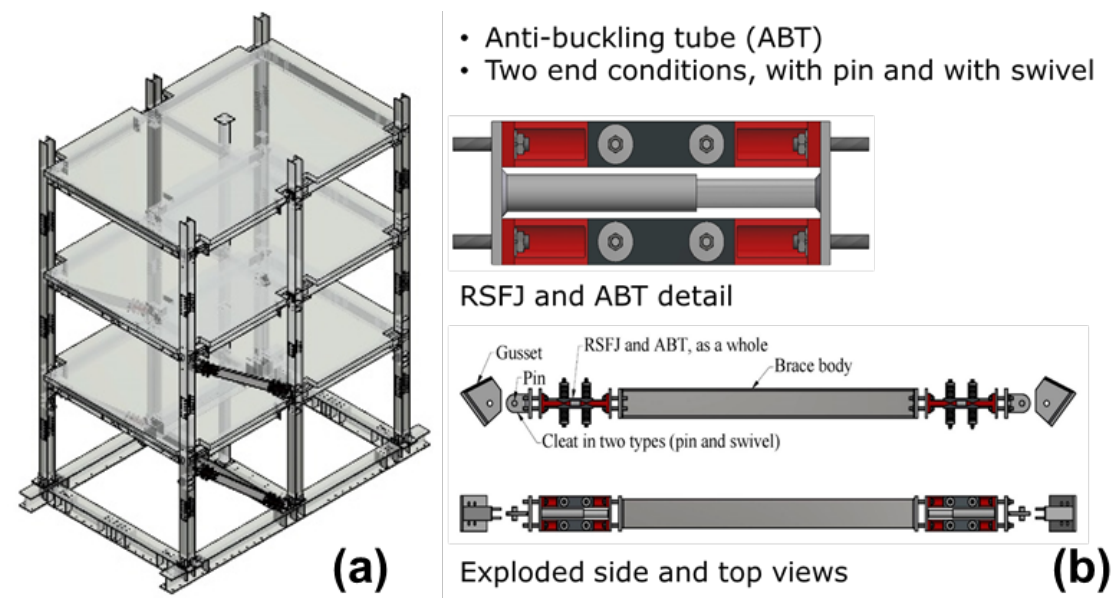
CBF with RSFJ Compression and Tension Brace (a) 3D View and (b) Design Features
